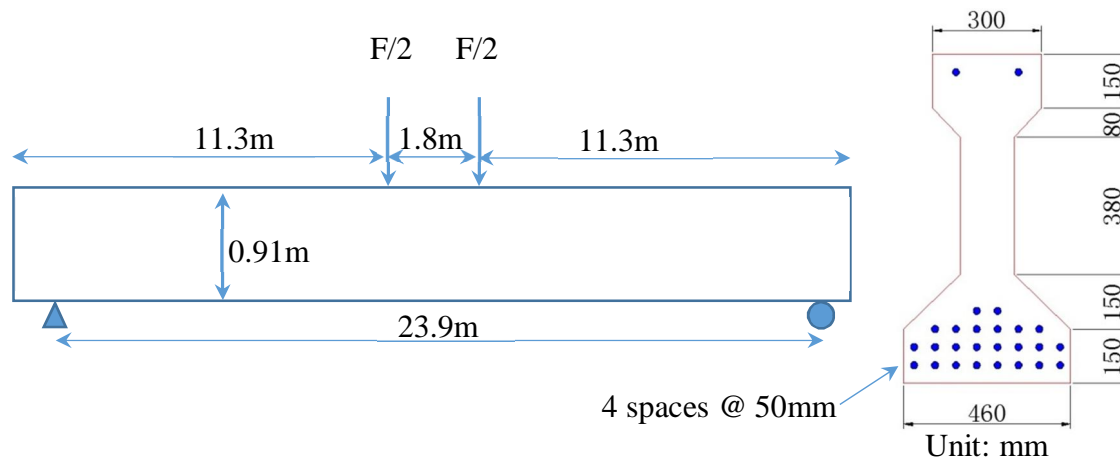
Sketch for AASHTO type II girder (Park, 2003).
